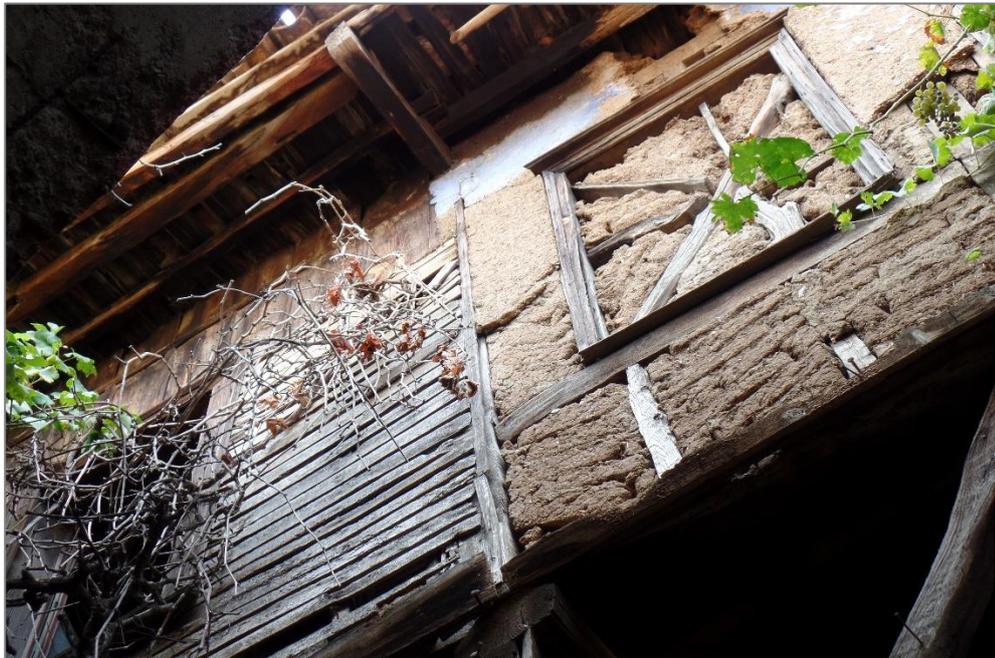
Bağdadi technique -2819-1-9 (above), 2805-1 (below)
